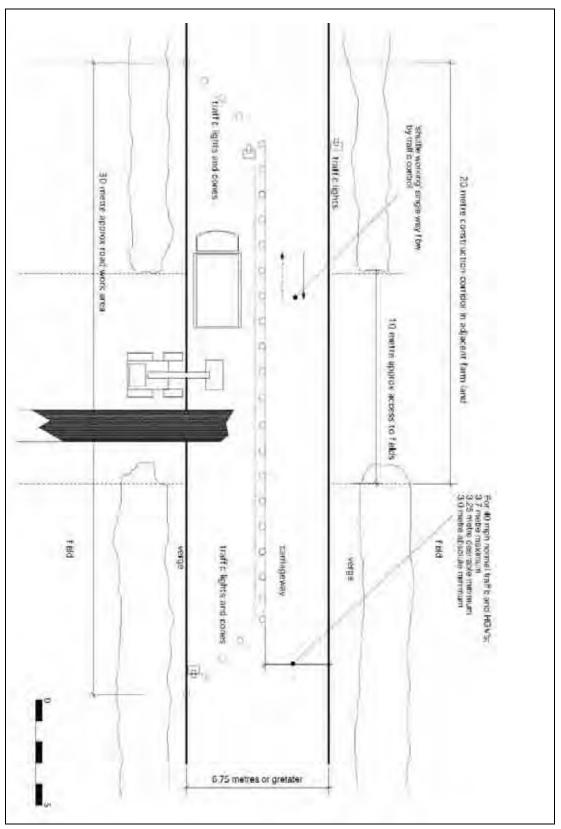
Illustrative arrangement of typical traffic management and working trench width to cross Public Highways more than 6.75m in width
